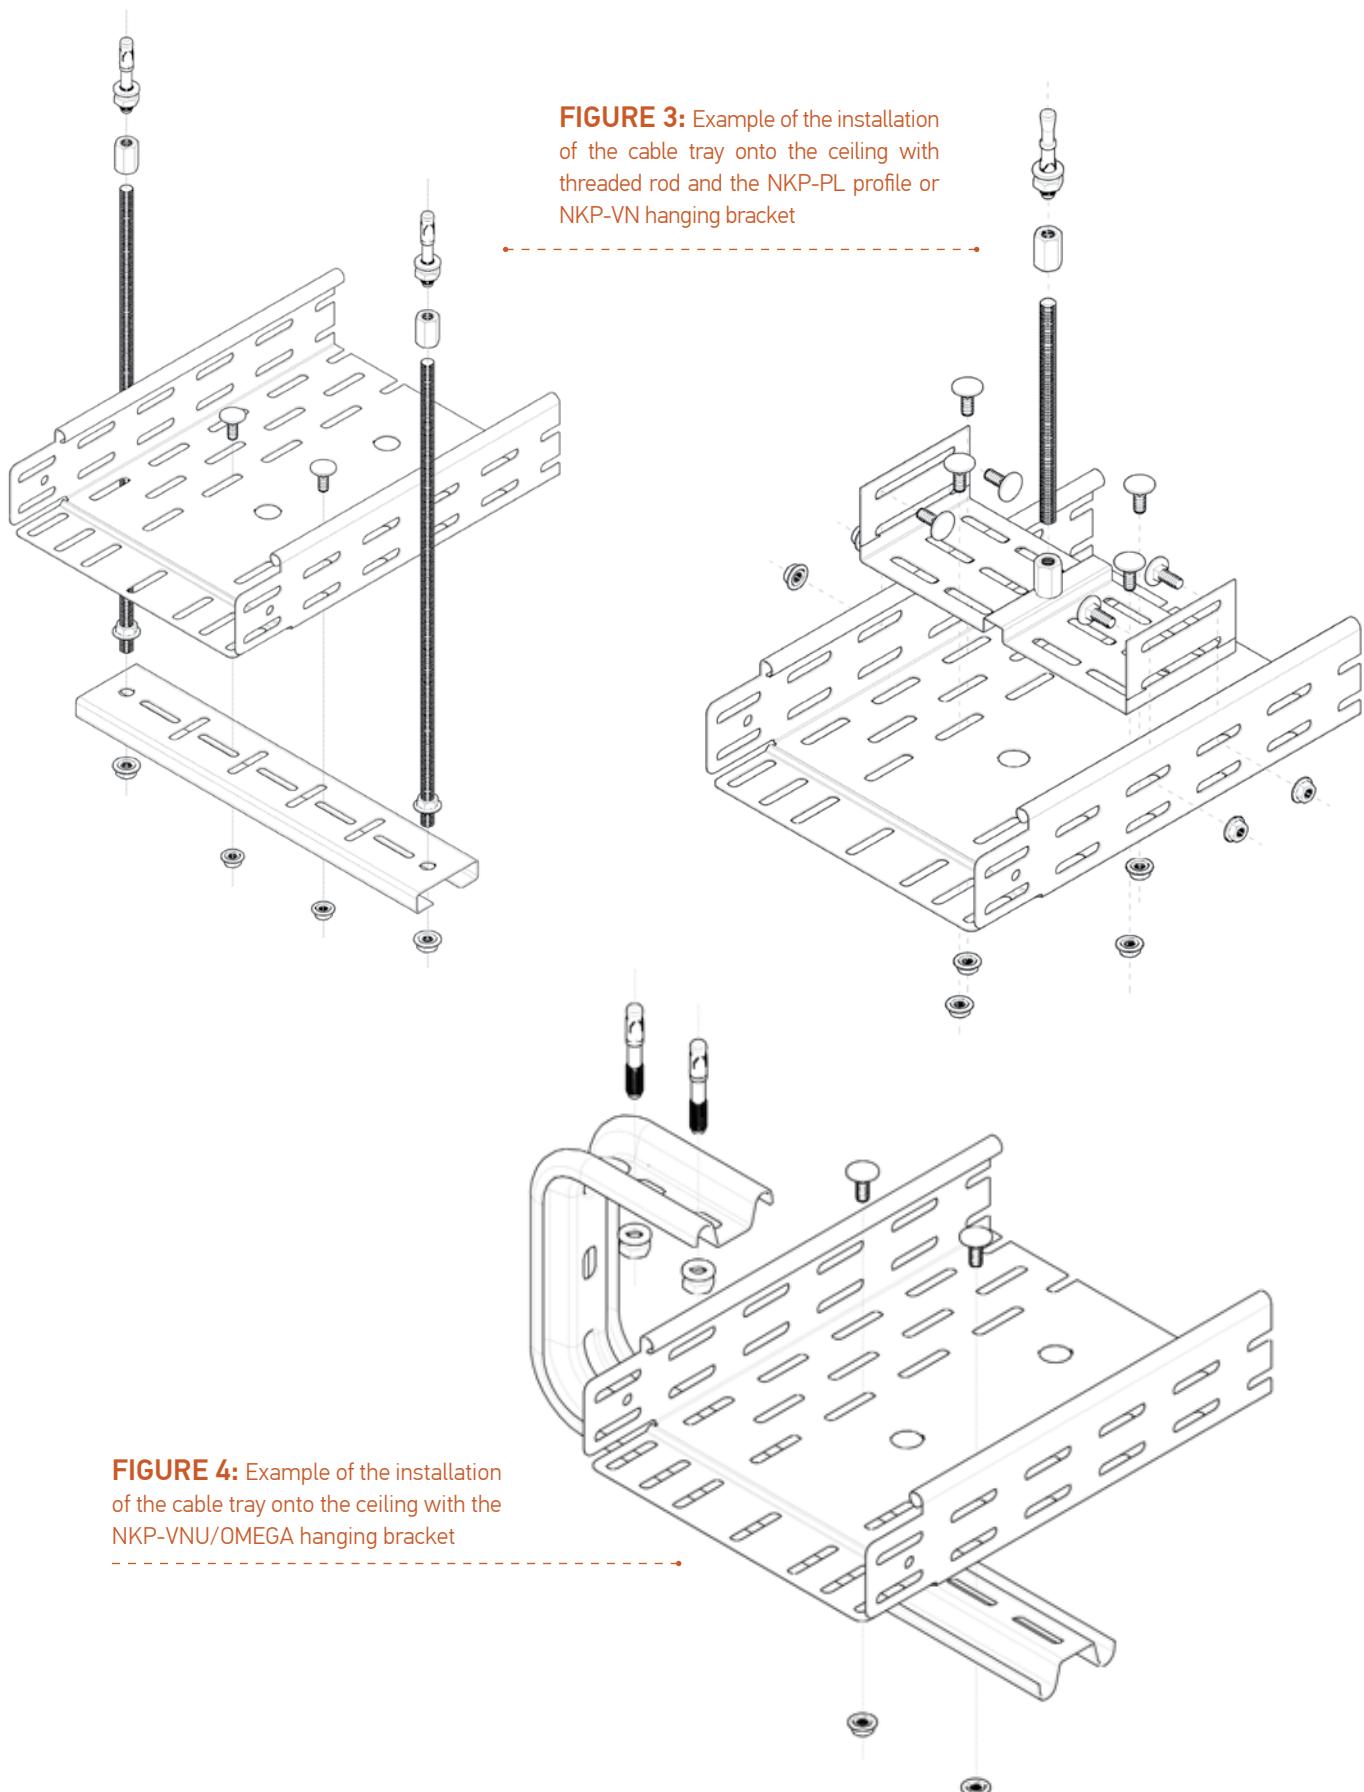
Example of the installation of the cable tray onto the ceiling with the NKP-VNU/OMEGA hanging bracket
